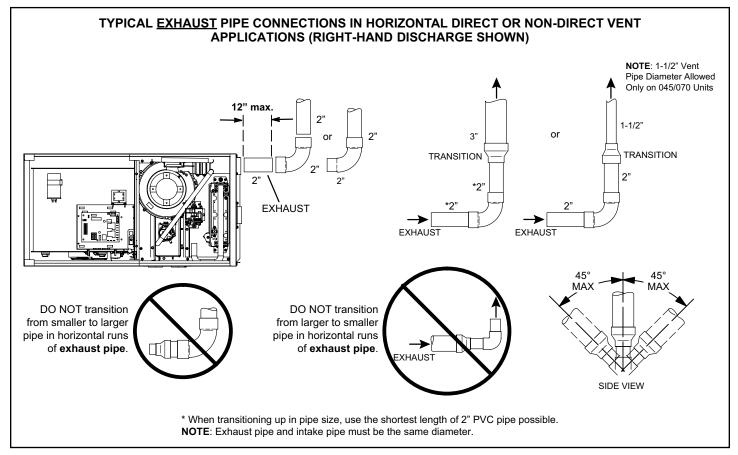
Typical Exhaust Pipe Connections in Horizontal Direct or Non-Direct Vent Applications (Right Hand Discharge Shown)
